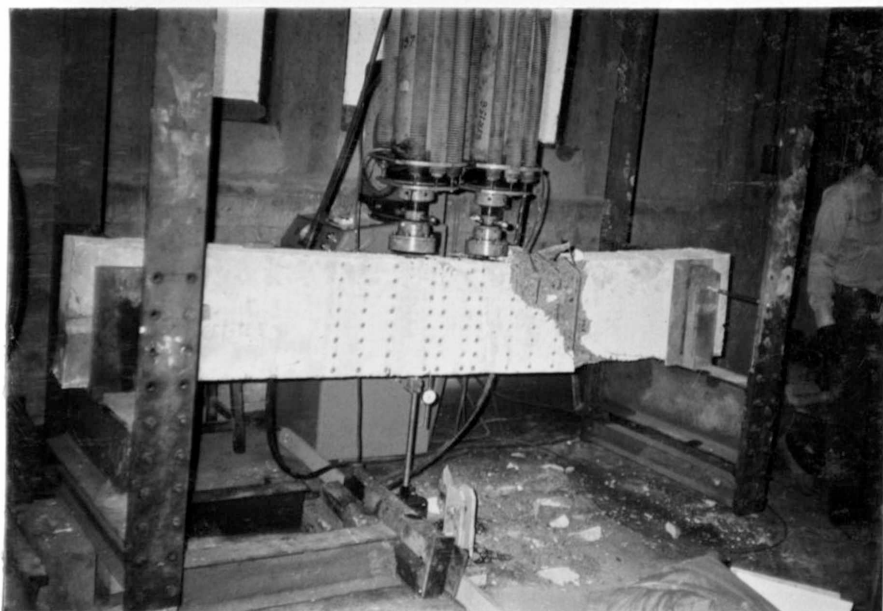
Beam CFT-TB1 at Failure (front side)
